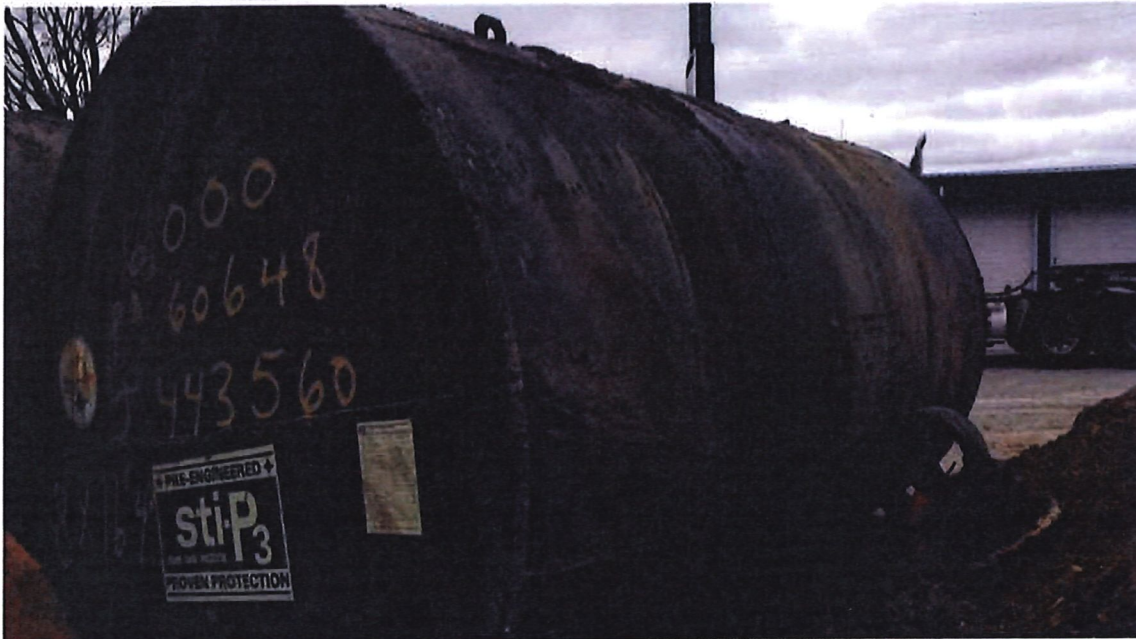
PHOTOGRAPH OF 12000 GALLON UNLEADED UST FROM SOUTHERN TANK EXCAVATION
